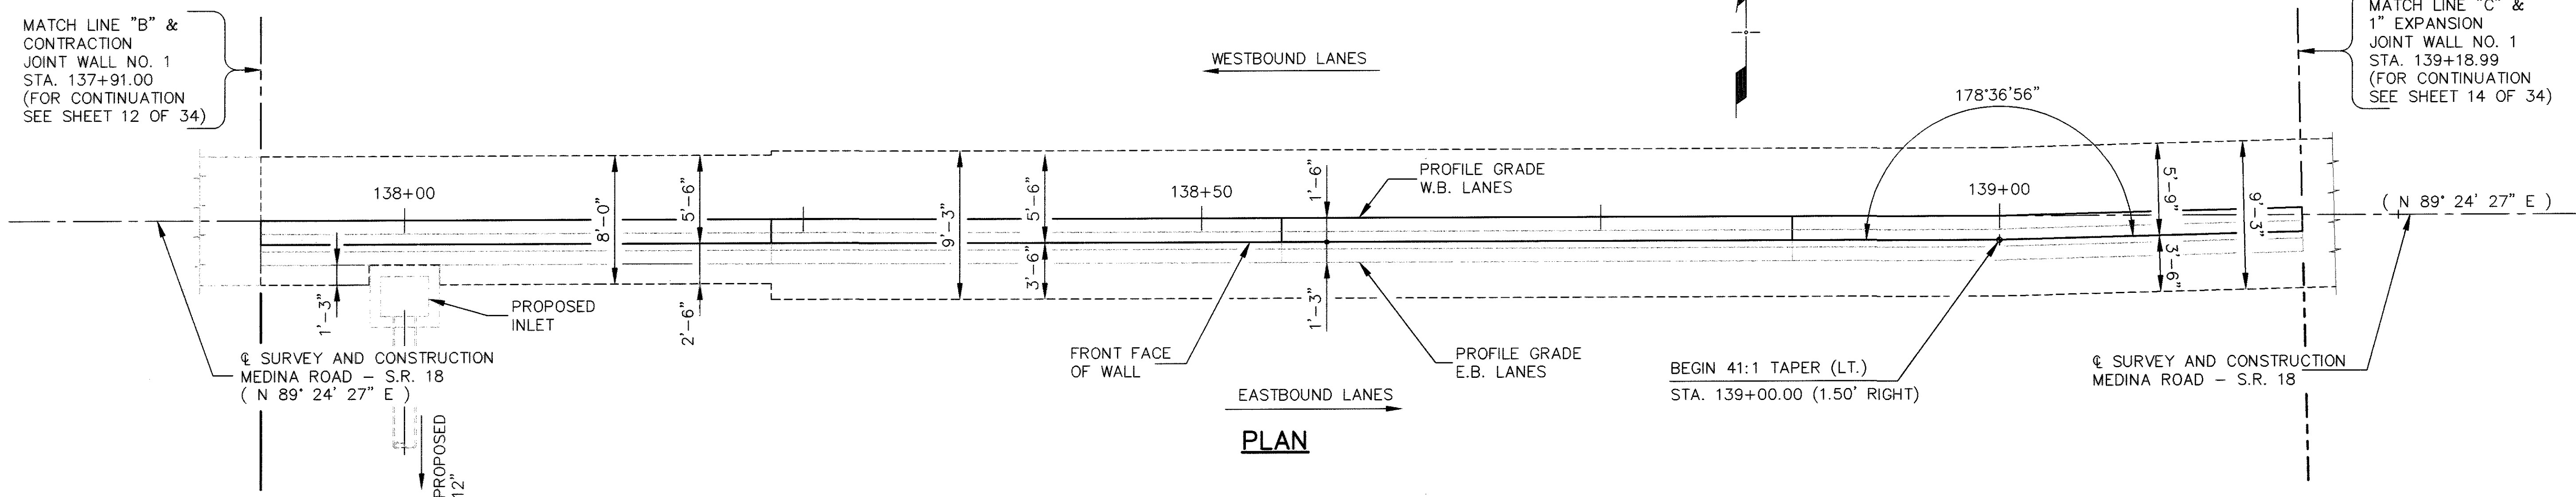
(PANELS W1-5 THRU W1-8)
